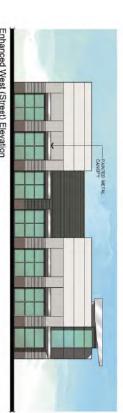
Conceptual Prototype Elevations – Buildings 1 – 14 and 17
